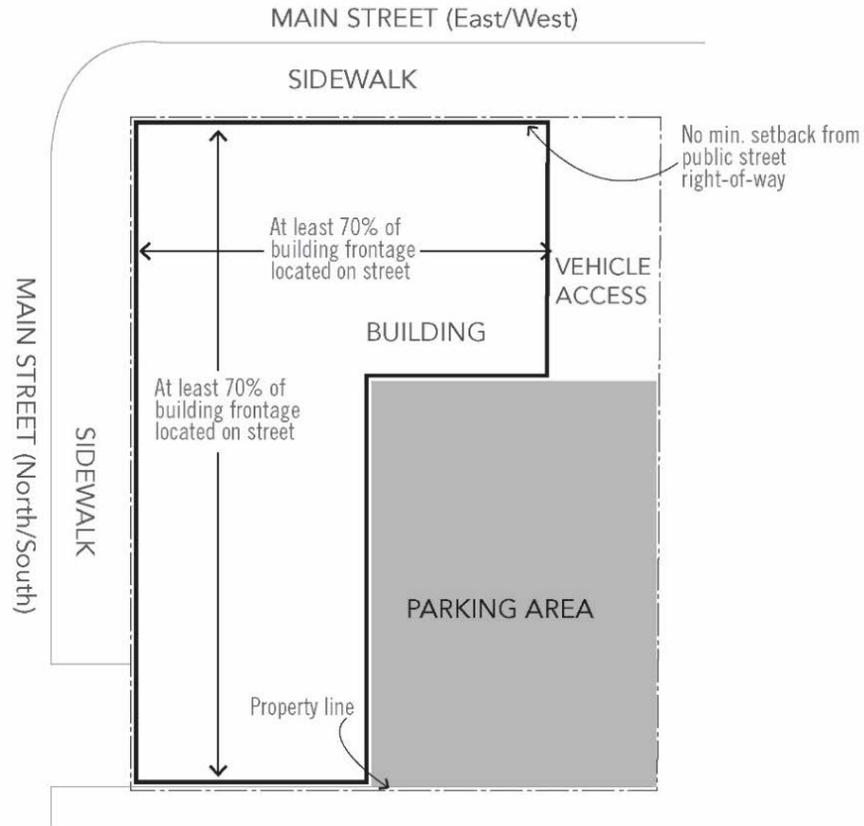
B. Building Placement and Location of Parking, Main Street/Local Street Intersection (typical)
